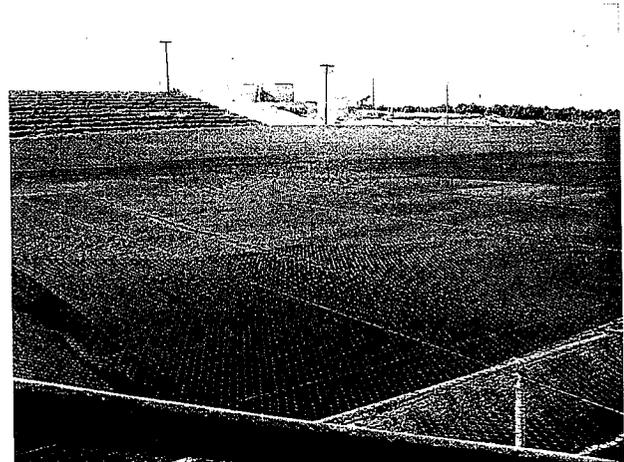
View of a separation sumps and wastewater sumps looking west.
